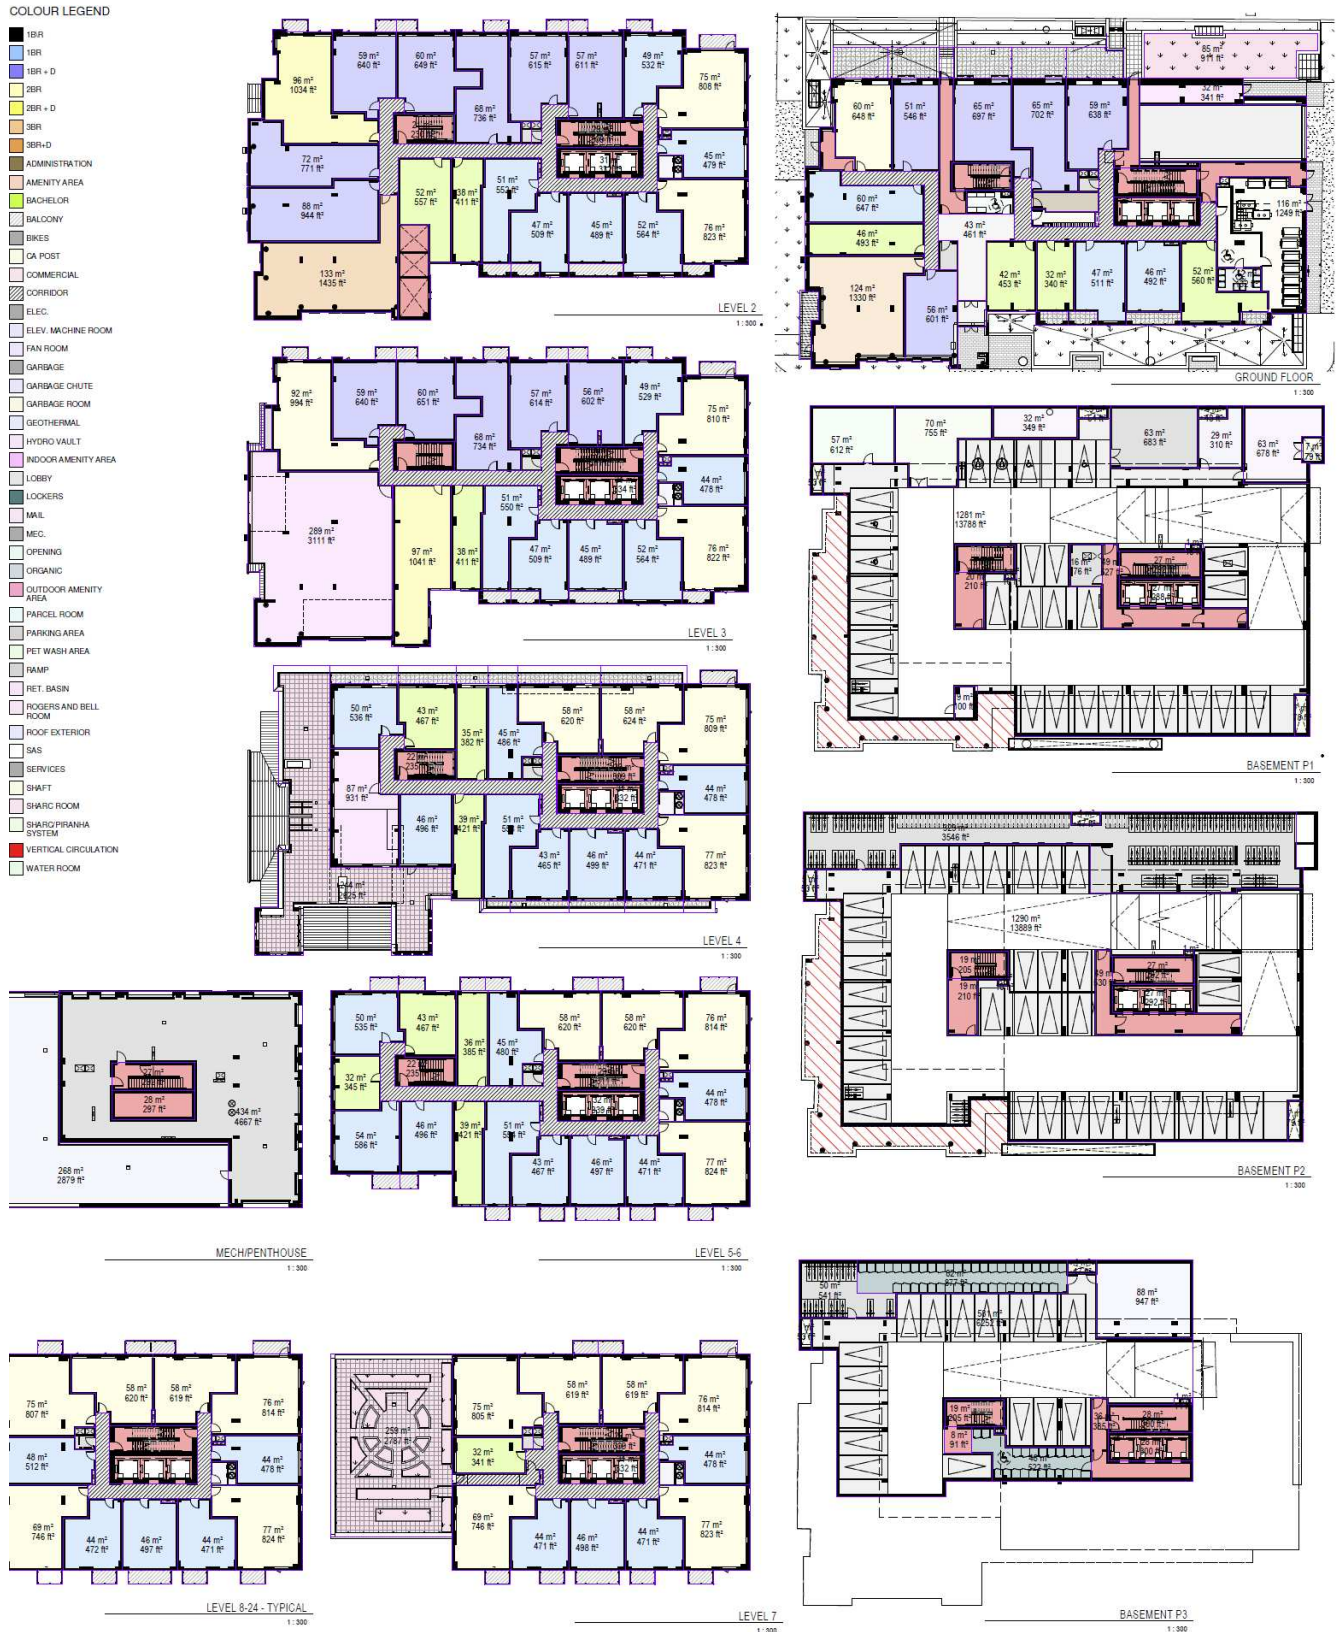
Floor plans illustrating the arrangement of both indoor and outdoor amenity space, parking, and the variety of units. Source: Neuf, 2024.
